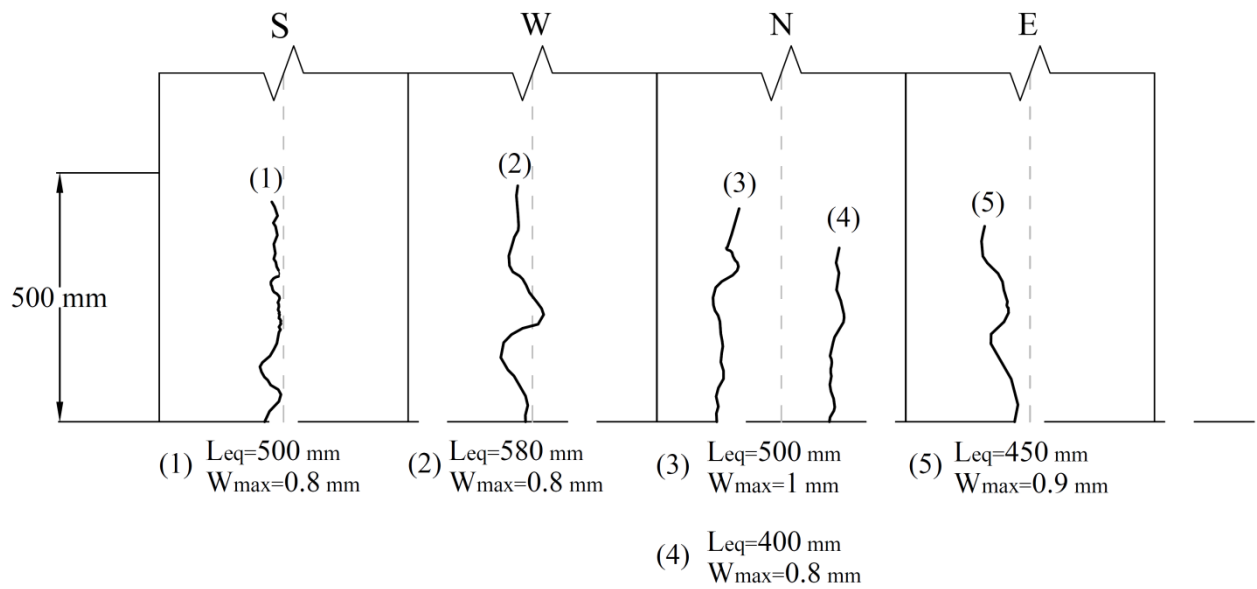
Details of corrosion-induced cracking for corroded L1 test unit on the four sides
